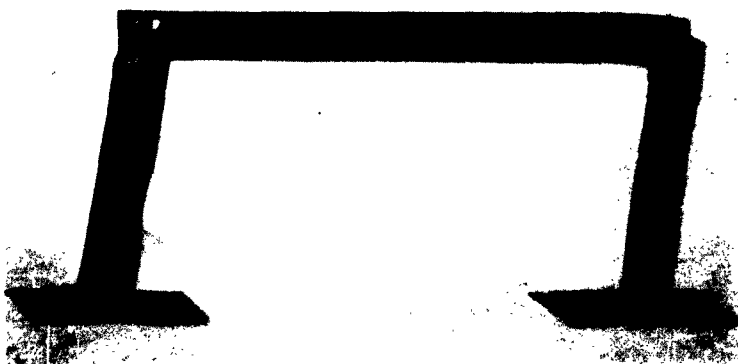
DRAWING OF 1:15 SCALE MODEL SHOWING CONSTRUCTION DETAILS
